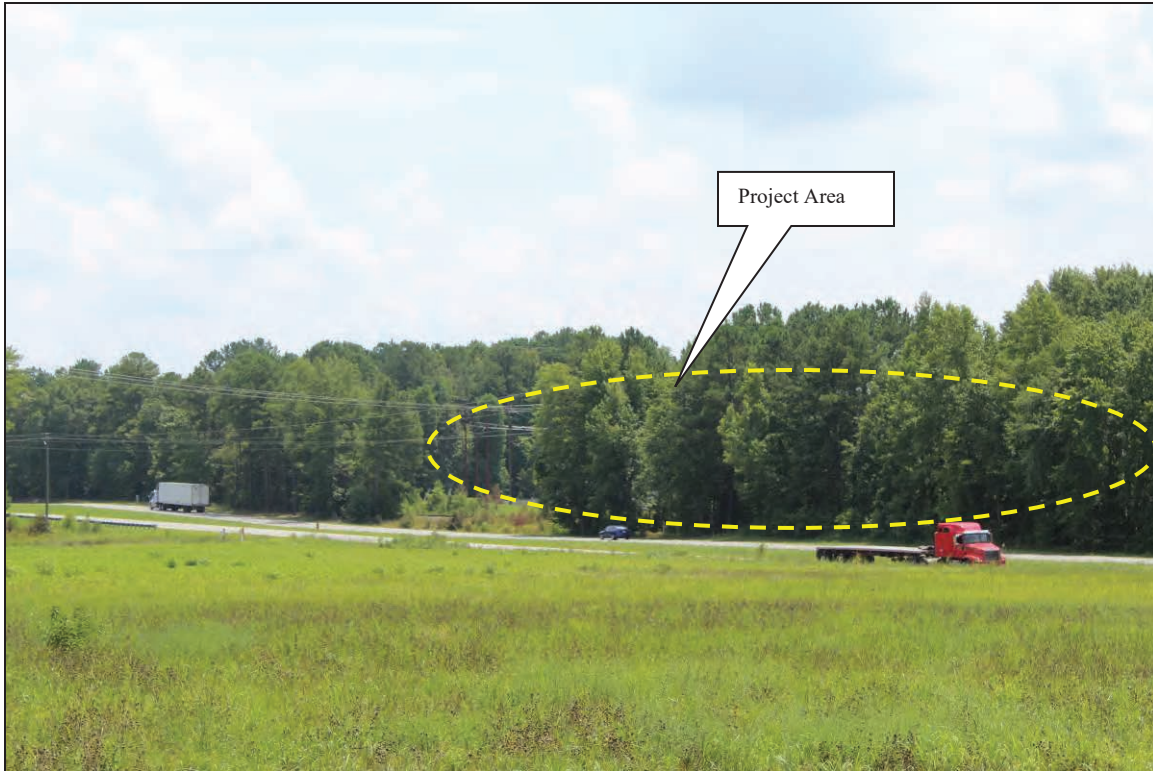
Photo location 11- Detail of view from Chambliss House homesite towards project area (not visible) showing existing transmission line (not included in this rebuild project), facing southeast.
